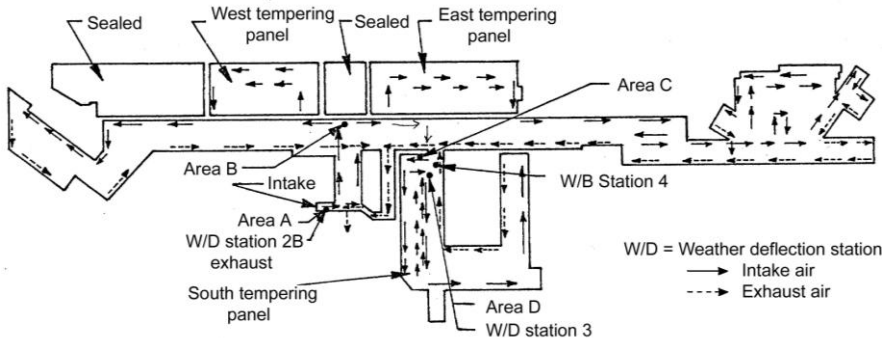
Mine layout showing mine ventilation plan and location of air tempering section (Aughenbaugh and Bruzewski, 1973)
